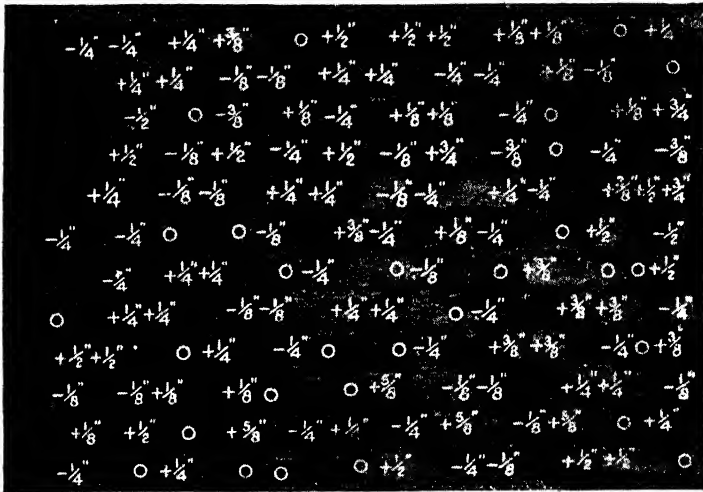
Detail of skintled brickwork. Plus dimensions indicate projection beyond wall line. Minus dimensions indicate set-back from wall line.
